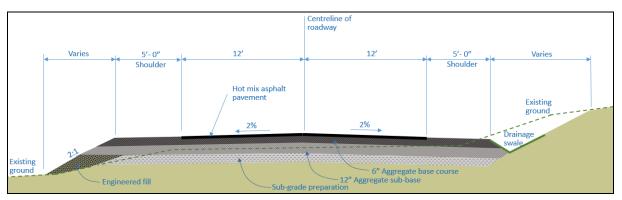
Typical road cross-section. Based on the design standard developed for Kosrae circumferential road extension project (Barret Consulting Group Inc., 1987).
